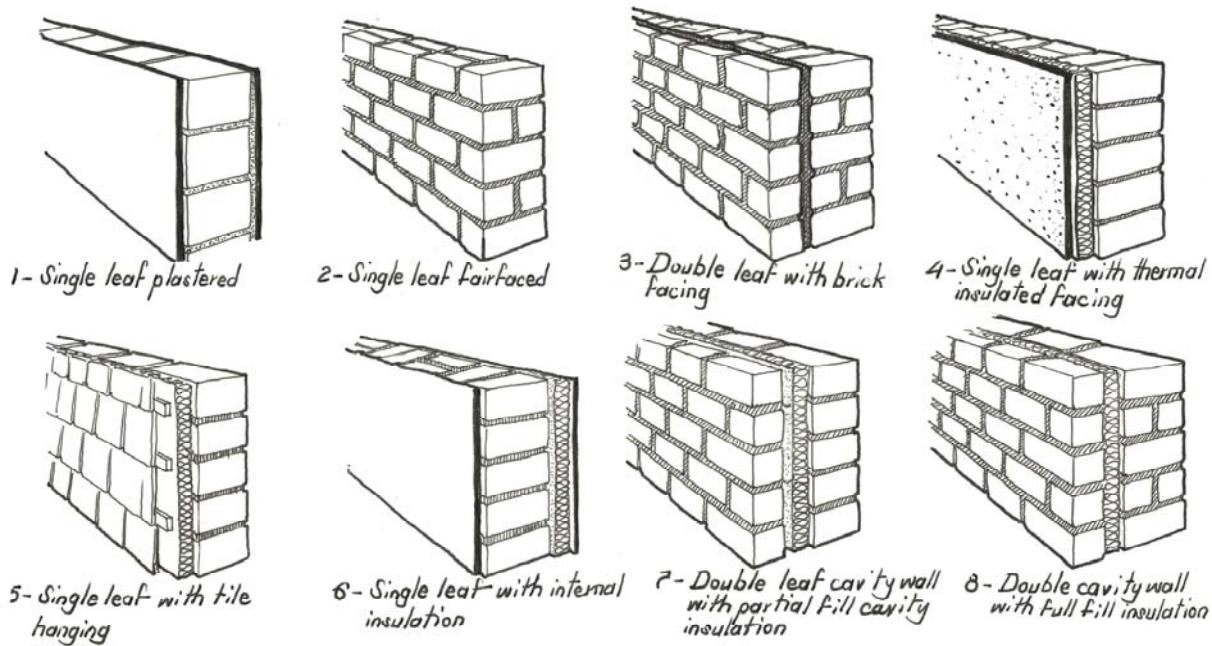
Brick masonry (Drawn by the author, adapted from Neufert: Architects' Data, p. 63)
